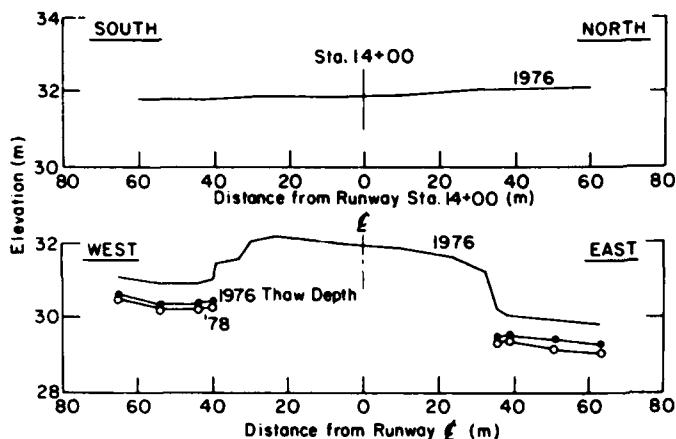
Surface elevations, south site, Galbraith Lake Airfield. The upper graph shows the elevations on the centerline; the lower graph shows the elevations on the cross section, station 14+00.
